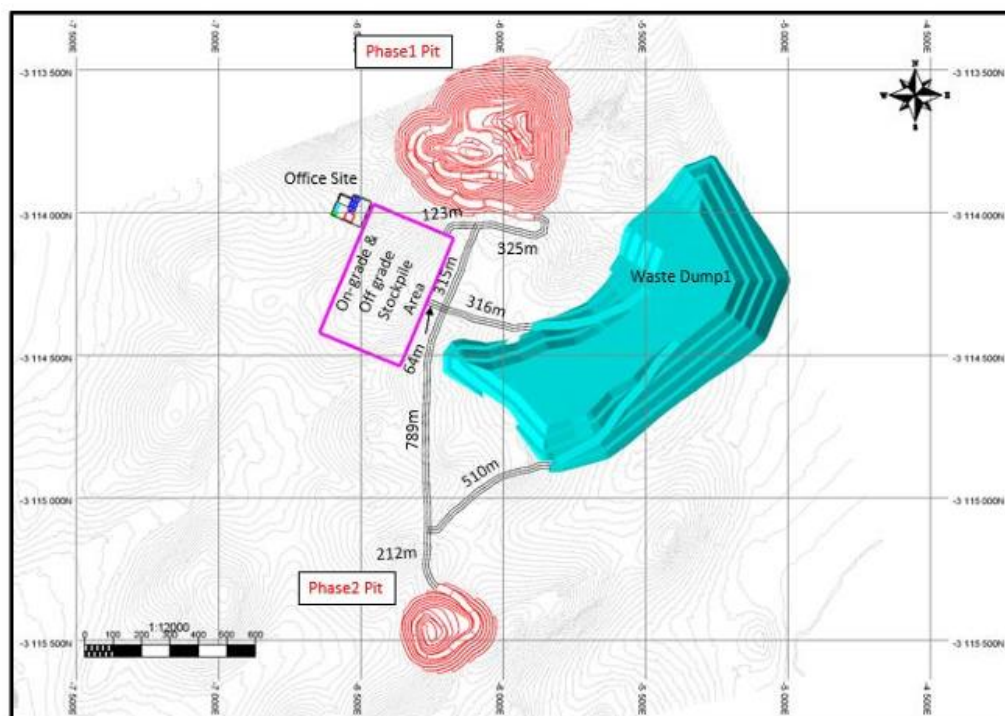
Preferred Layout of Pit 1 (north) and Pit 2 (south)
